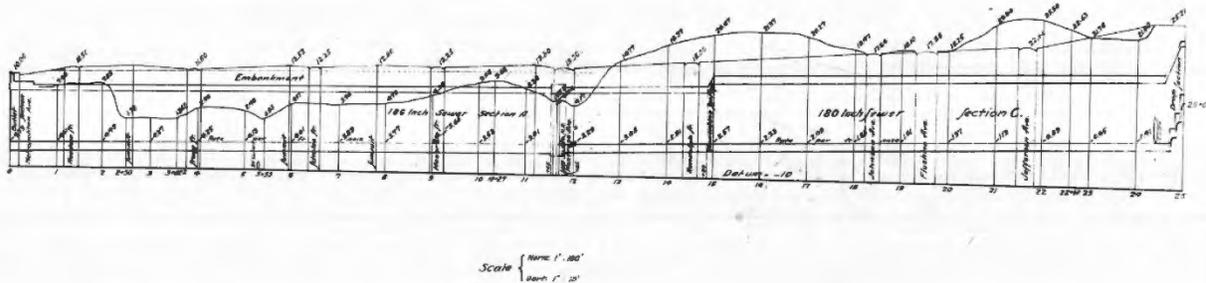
Longitudinal Profile of NC-083 Outfall Barrel.
